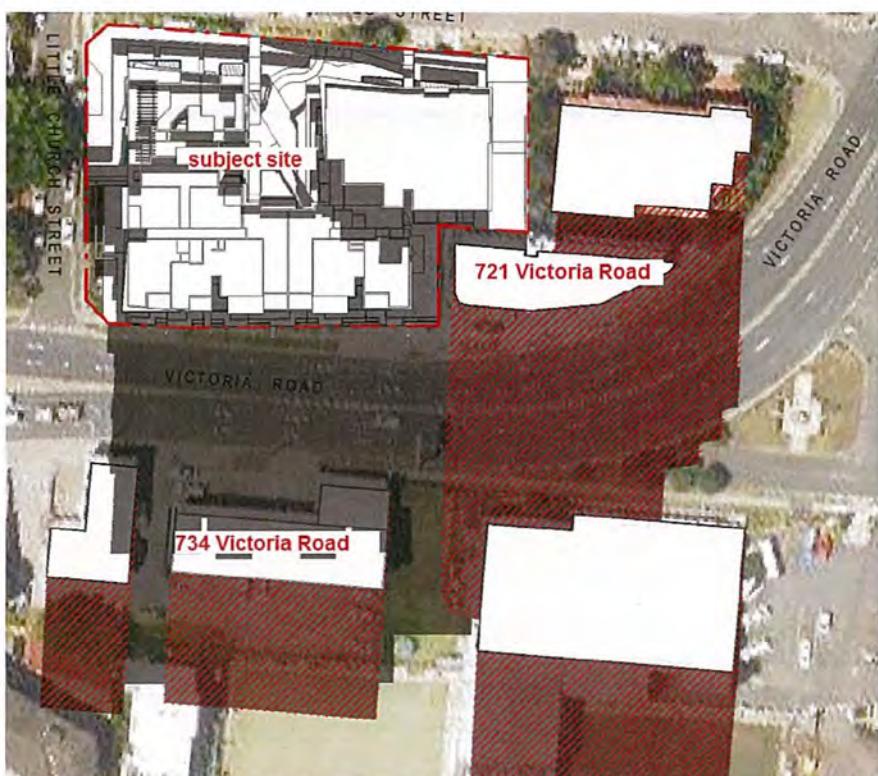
Overshadowing at 9am – some overshadowing to the north west corner of 721 Victoria Road.
